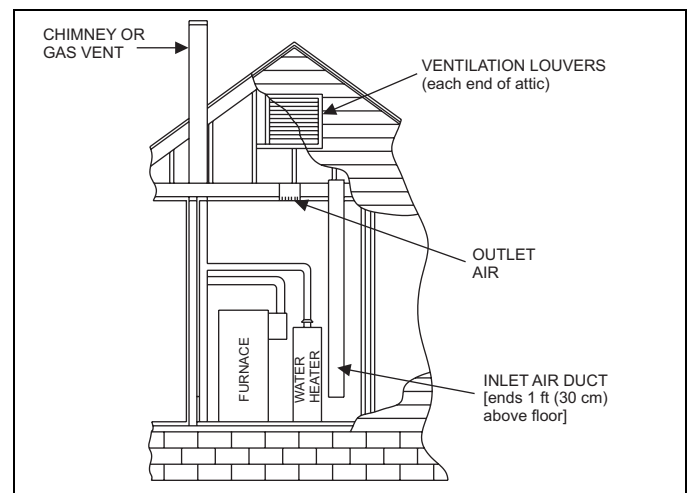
Air Inlet, Outlet and Chimney Connections
